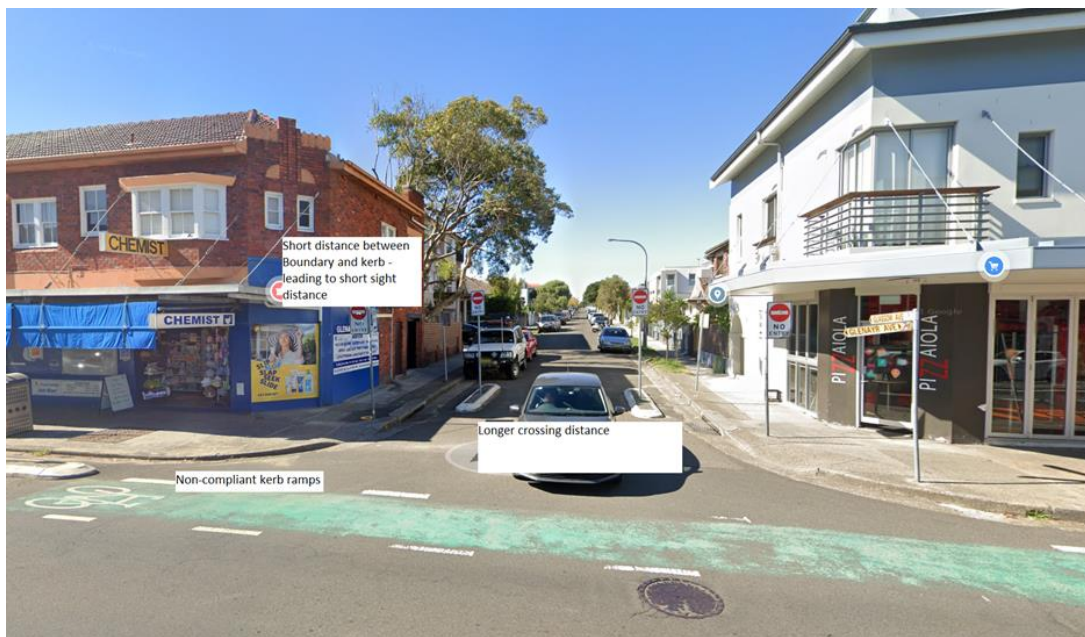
Existing conditions – Intersection of Glasgow Street and Glenayr Avenue.
